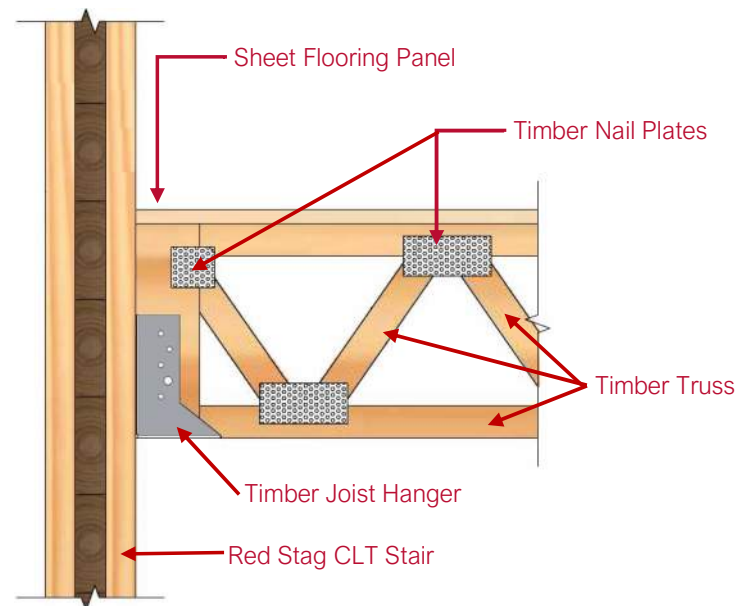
Timber floor truss to Red Stag CLT wall panel connection detail.
